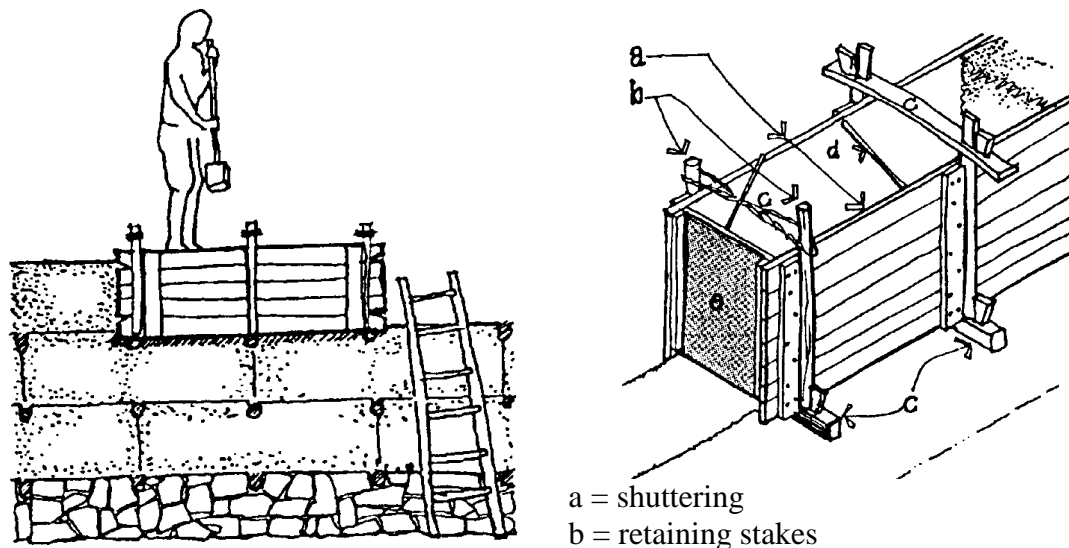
(i) rammed earth as practised in Morocco and (ii) basic elements of formwork or shuttering (from Norton¹⁹⁹⁷)
